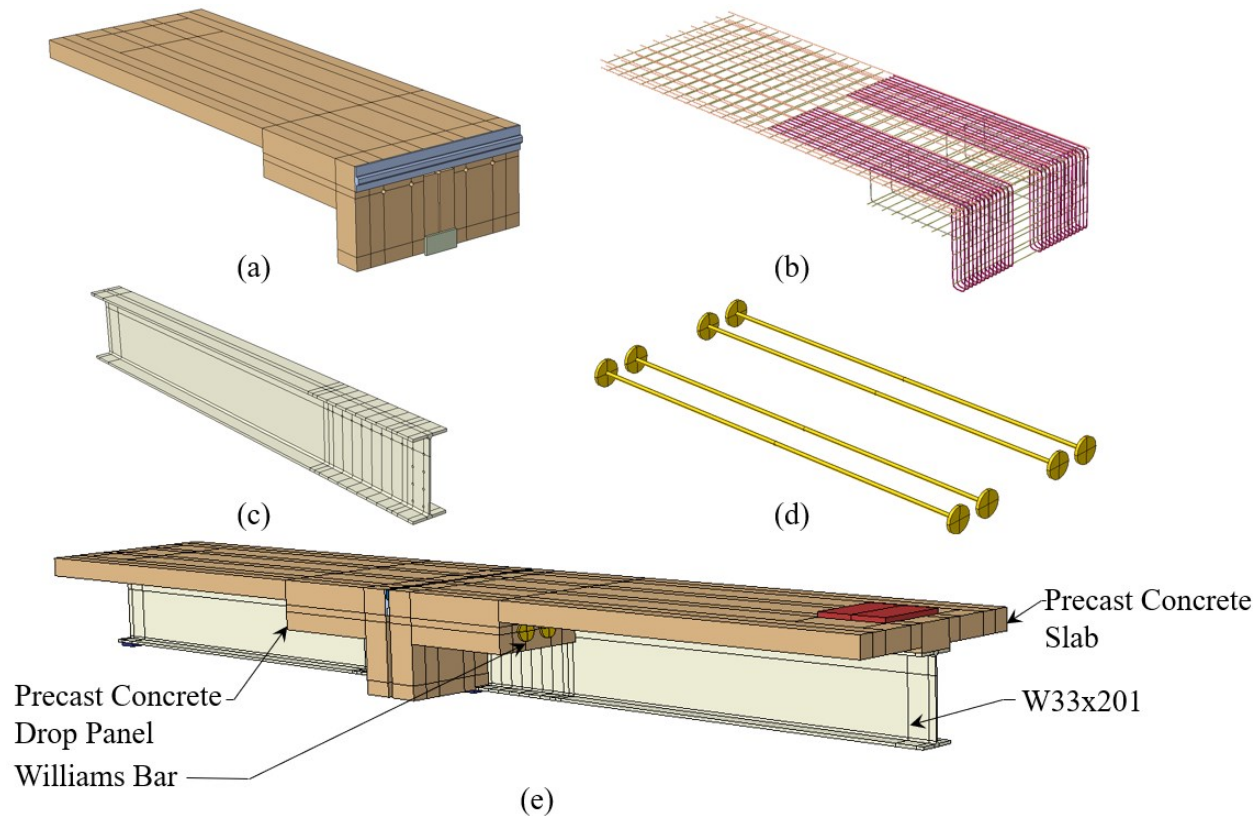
(a) Precast Concrete Deck with the Drop Panel, (b) Rebar Mat, (c) Steel Beam, (d) Williams Bars with Steel Plates, and (e) Model Assembly.
